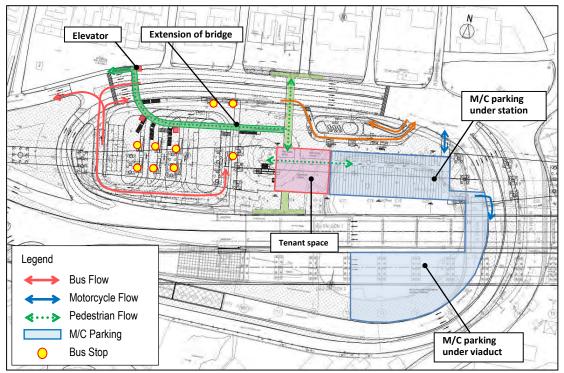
Concept Plan of the Tan Cang Station Area (upon UMRT opening)
